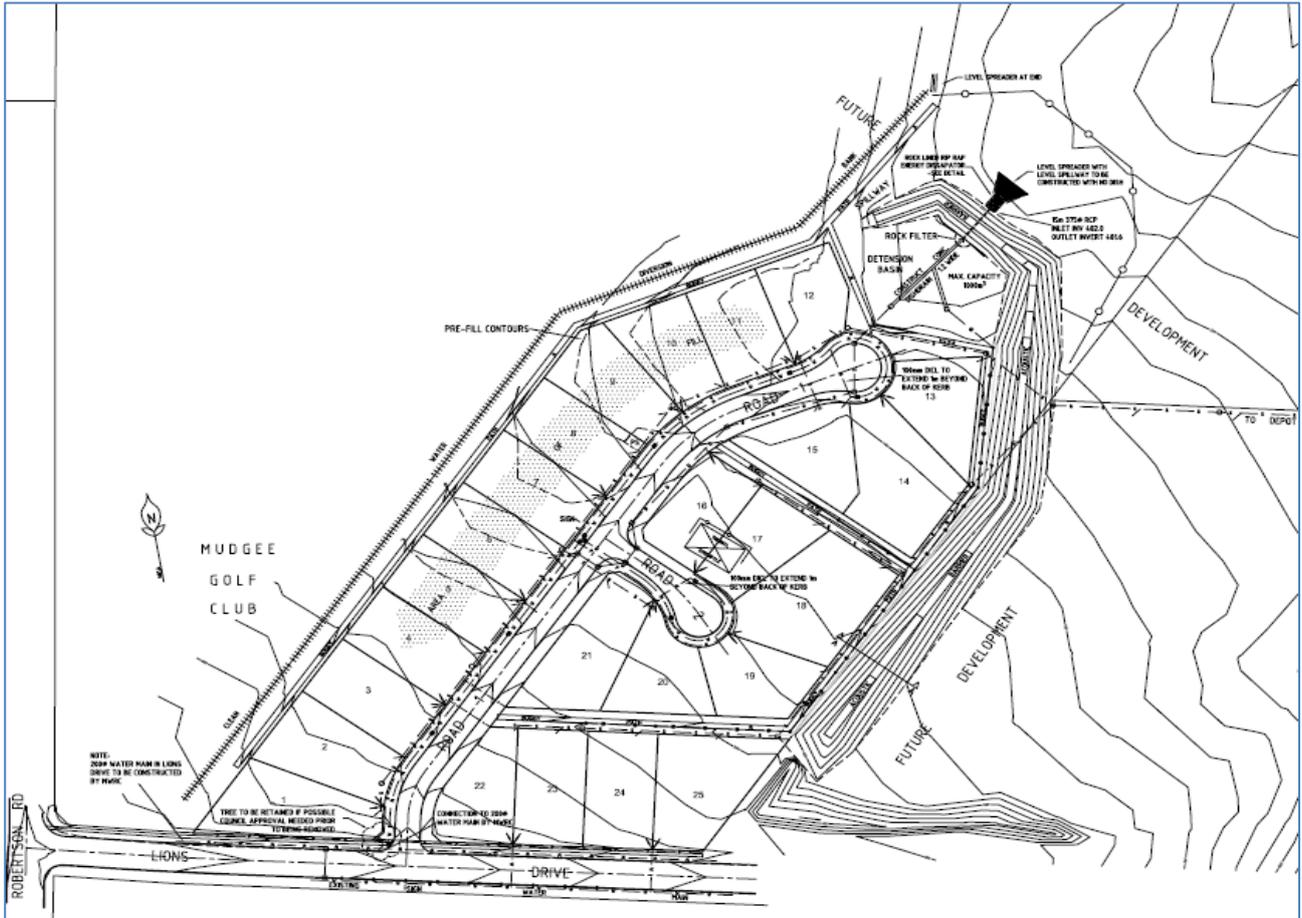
DA0132/2007 - Approved Stage 1 Subdivision Layout
